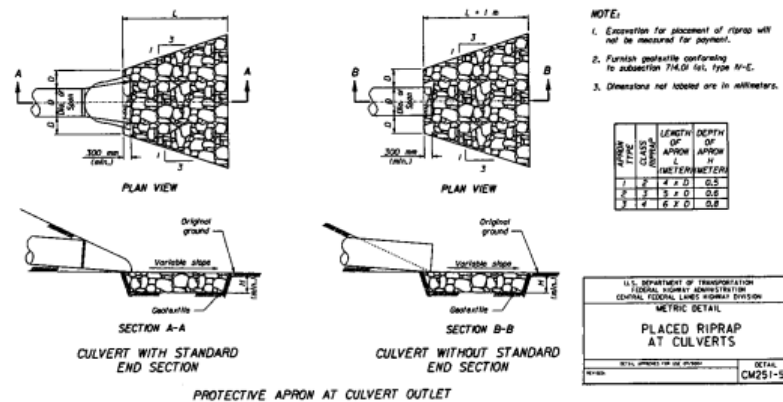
Placed riprap at culverts, from FHWA HEC 14, Figure 10.4
